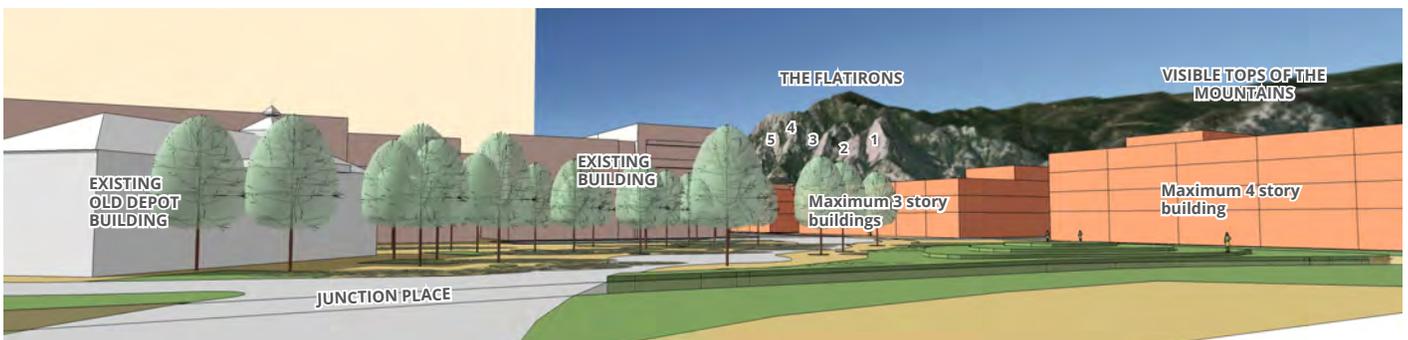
(5). Example Documentation of Preserved Views from Junction Place Bridge
